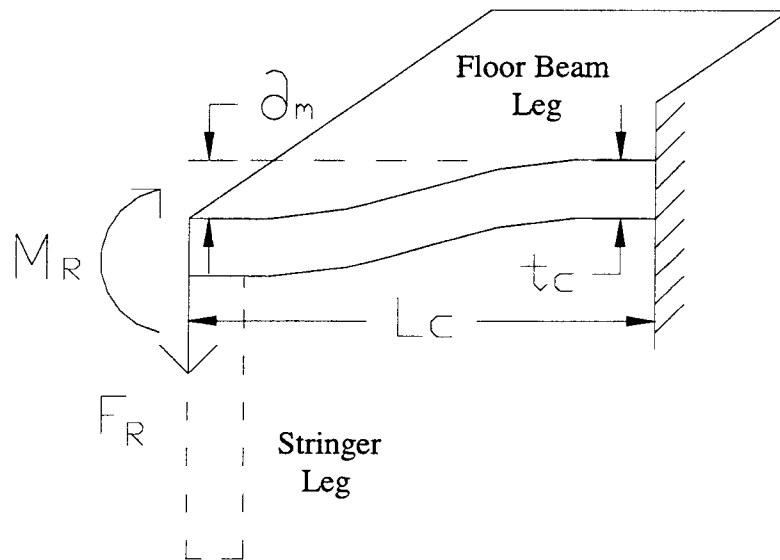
Top of the floor beam leg of the clip angle modeled as a cantilever beam.
